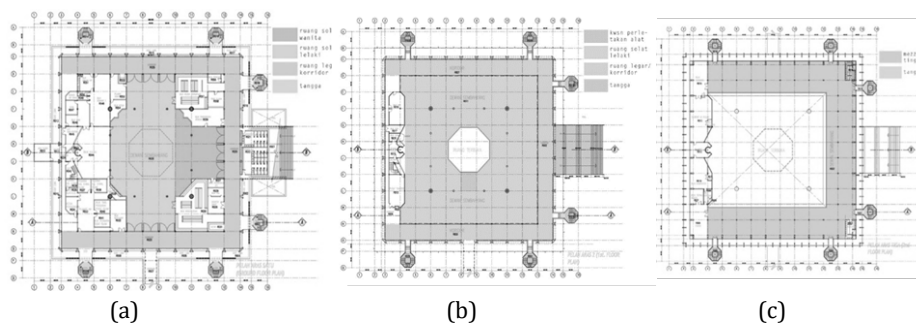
The prayer areas at the (a) ground floor level, (b) first and second floor levels.
